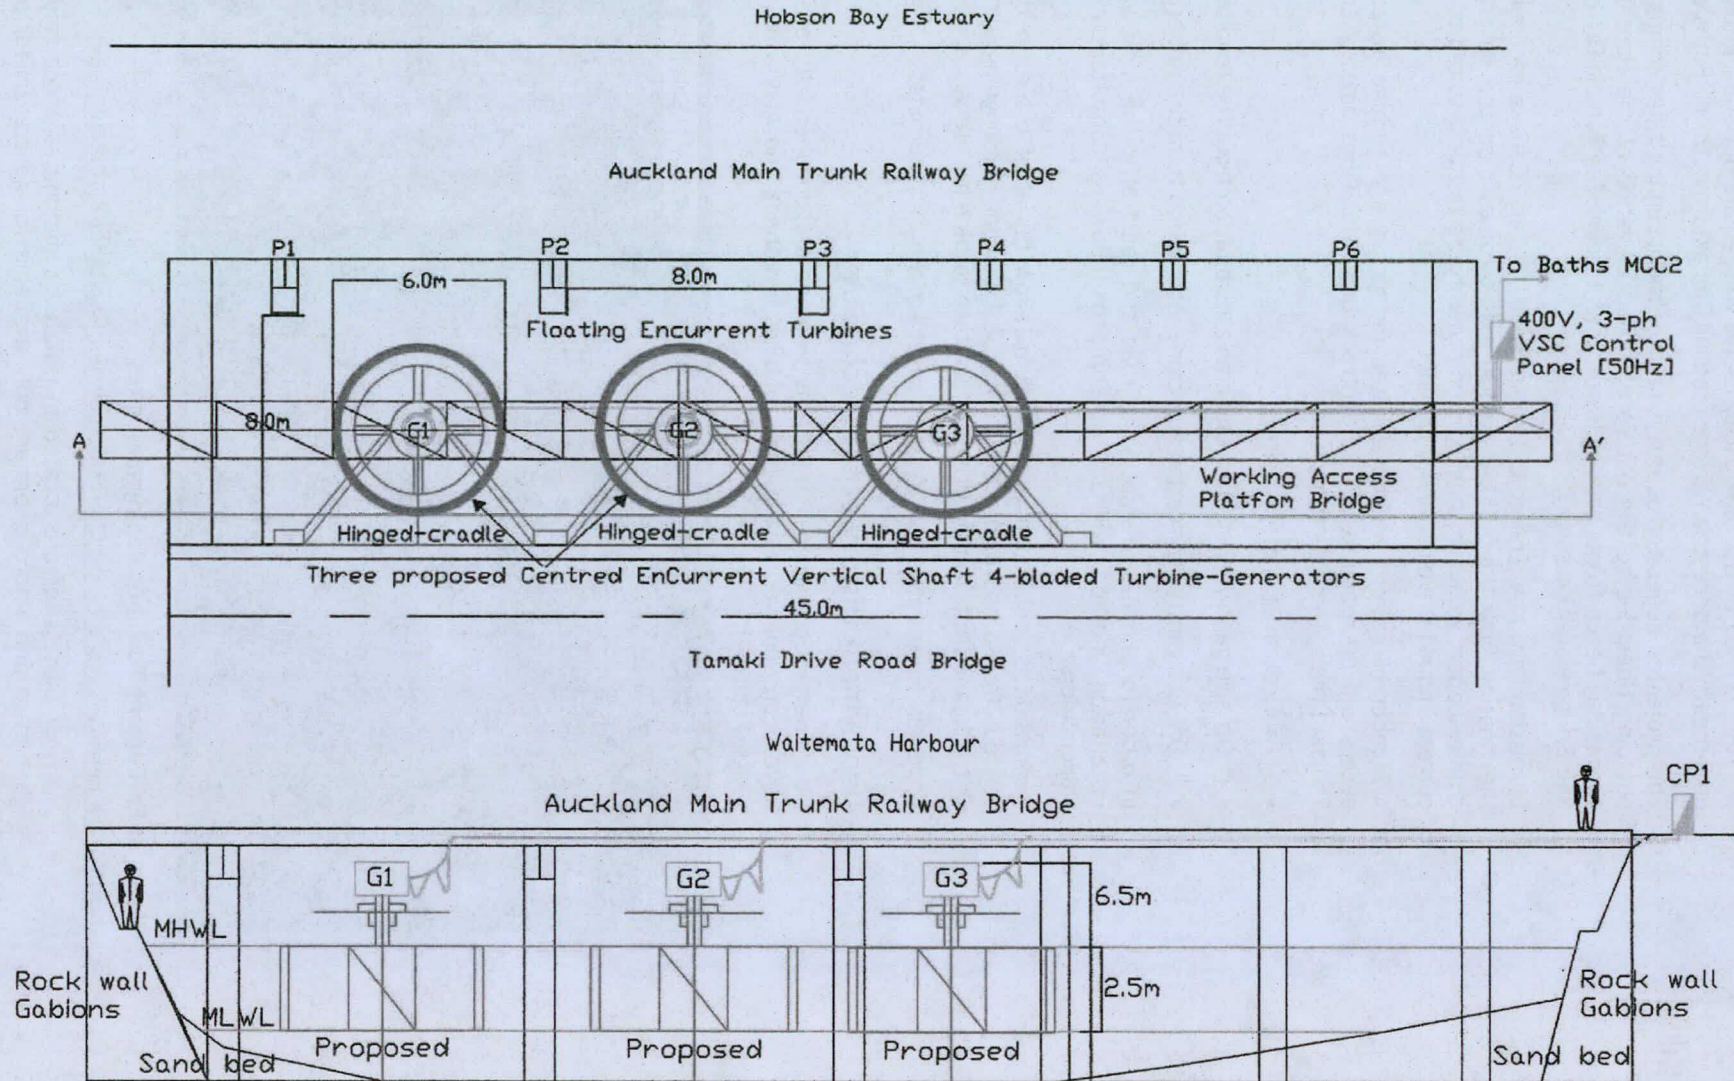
Elevation view of the proposed turbine arrangement in plan (top) and elevation (bottom) views
